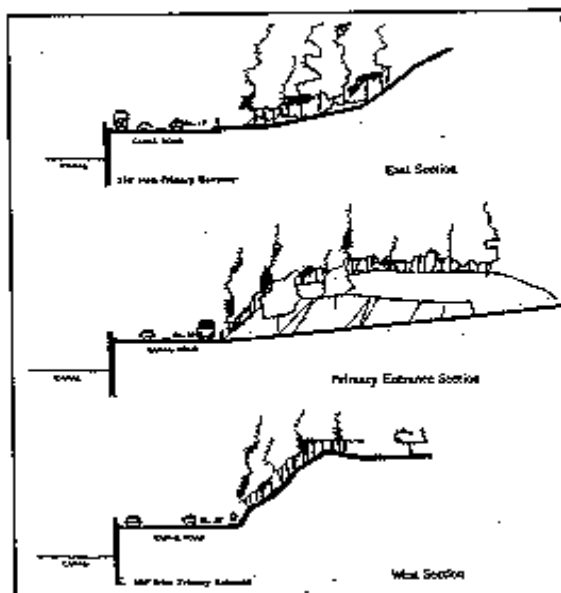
ALTERNATIVE 1 CROSS SECTIONS
